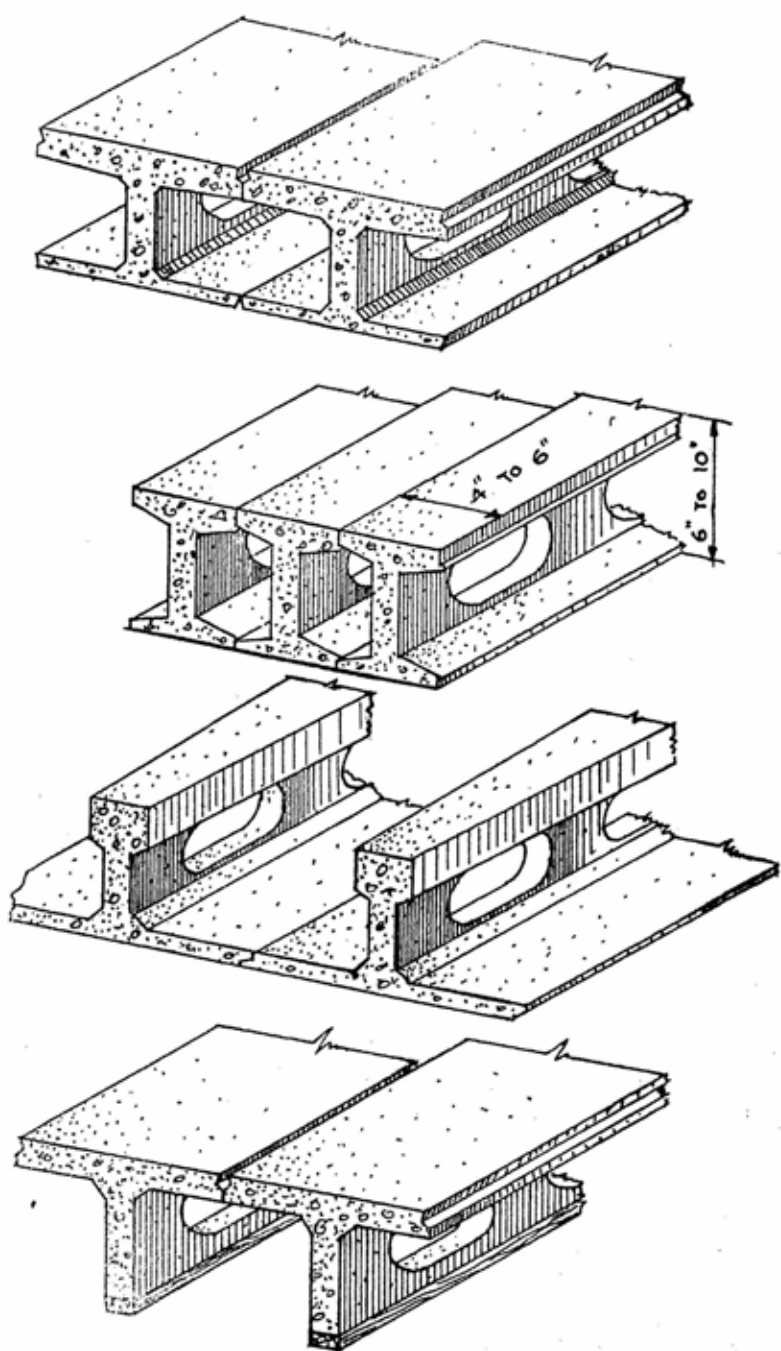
Precast floor systems, showing from top to bottom I-beam, Rapid floor, Rall system and T-section
